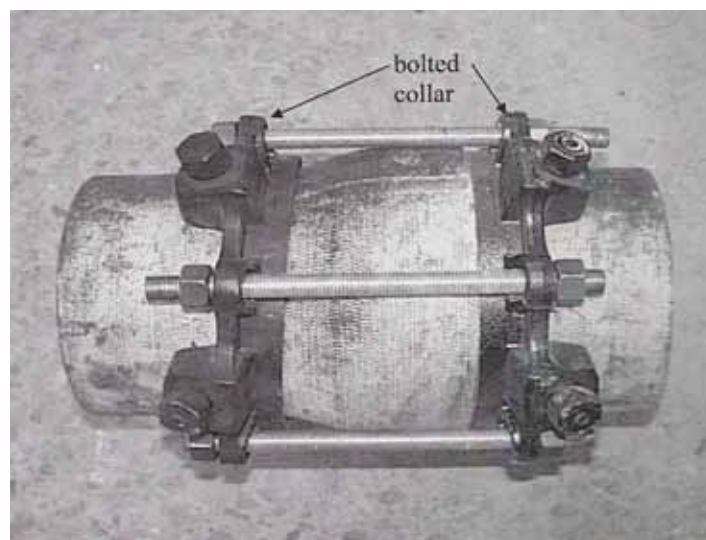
Ductile Iron Pipe – Push On Joint with Bolted Collar
